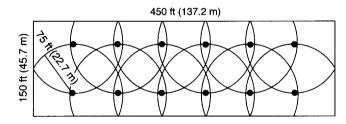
(a) Requirements for both travel distance and fire extinguisher distribution are met in this configuration representing 12 fire extinguishers mounted on building columns or interior walls.
